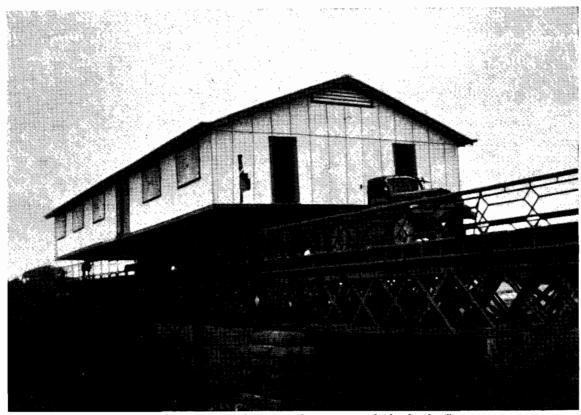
Army hut elevated to pass over bridge hand rail.
